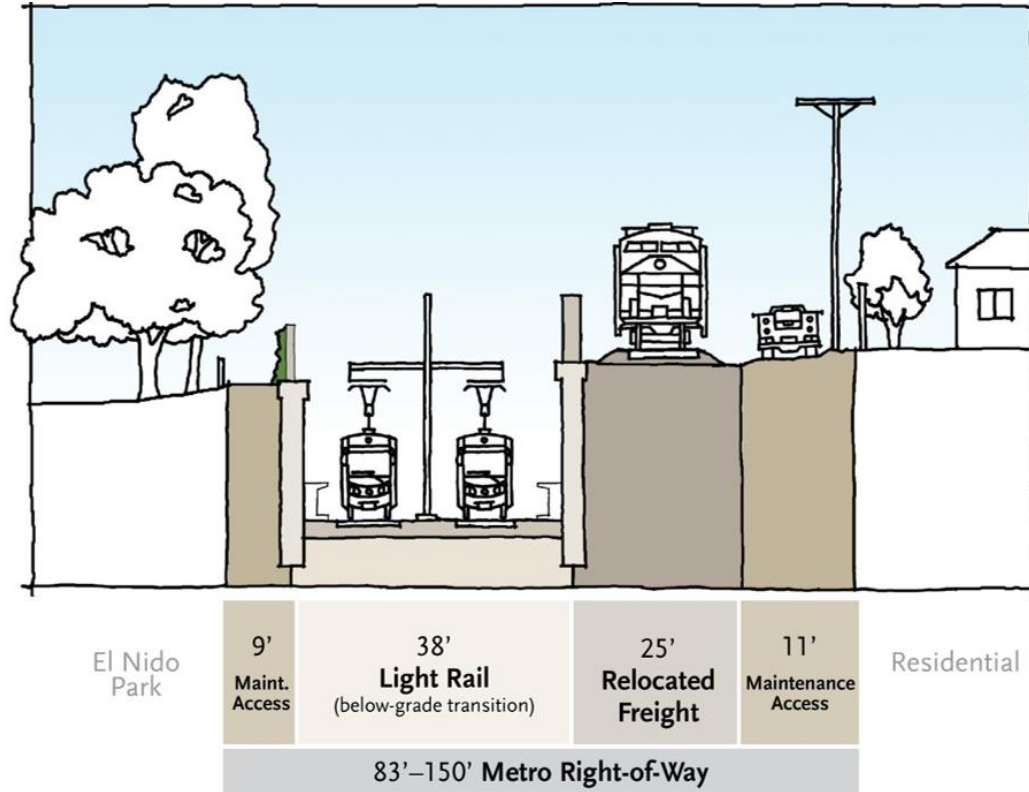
Trench Option – Looking South of Artesia Boulevard
